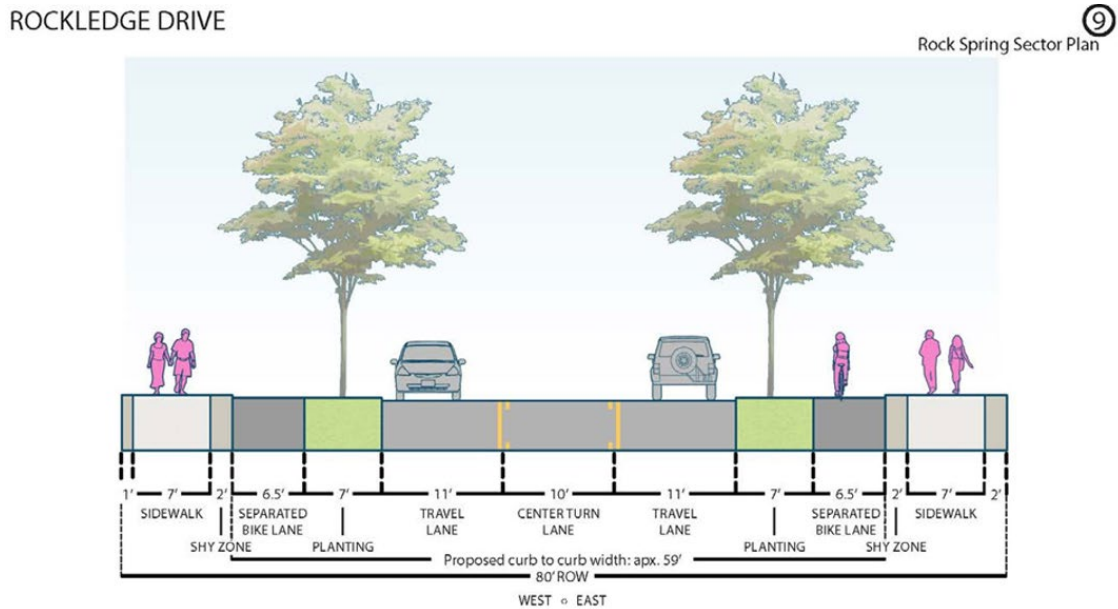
Rockledge Drive Cross-section from Rock Spring and White Flint 2 Design Guidelines
